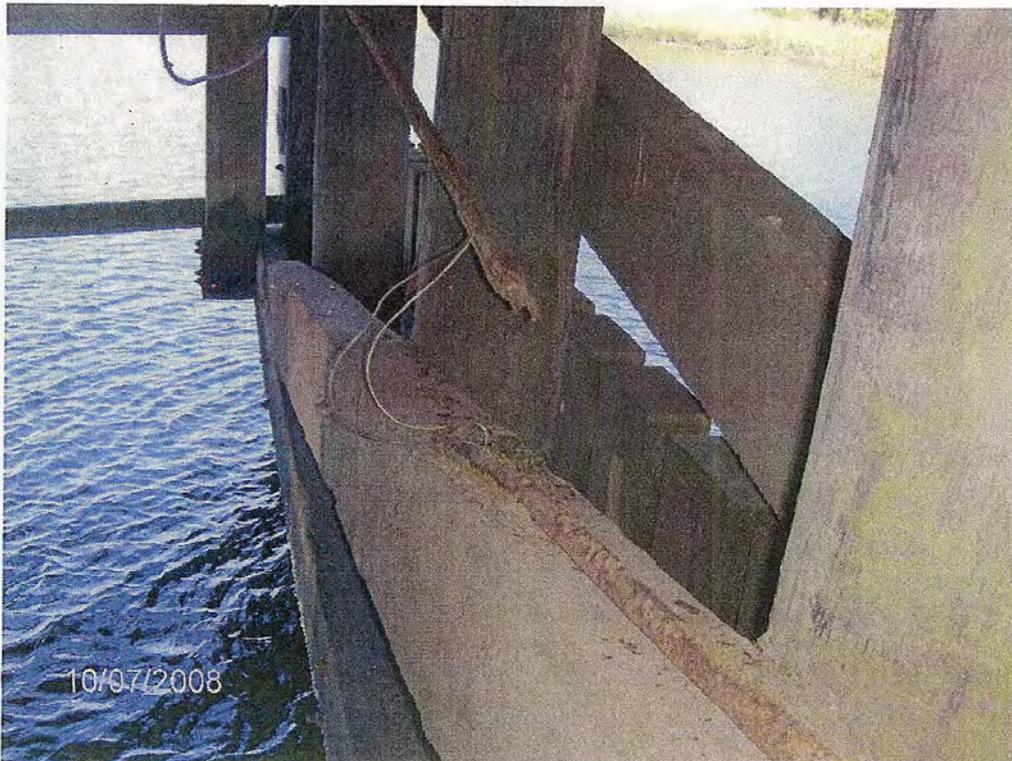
Deteriorated utility conduit with exposed wires at bent 7A.
